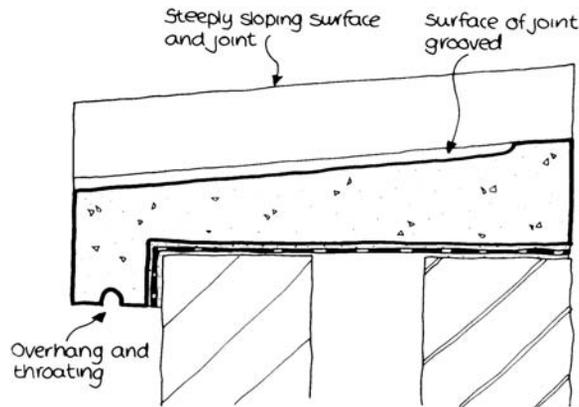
Sketch section through joggle-jointed sloping coping.
